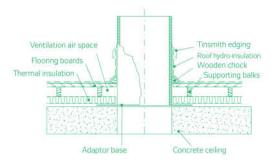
ROOF ADAPTOR ON A SLOPING ROOF
